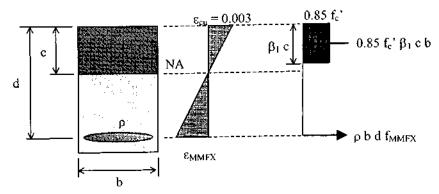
Equilibrium and Compatibility of an MMFX Reinforced Concrete Section at Failure
